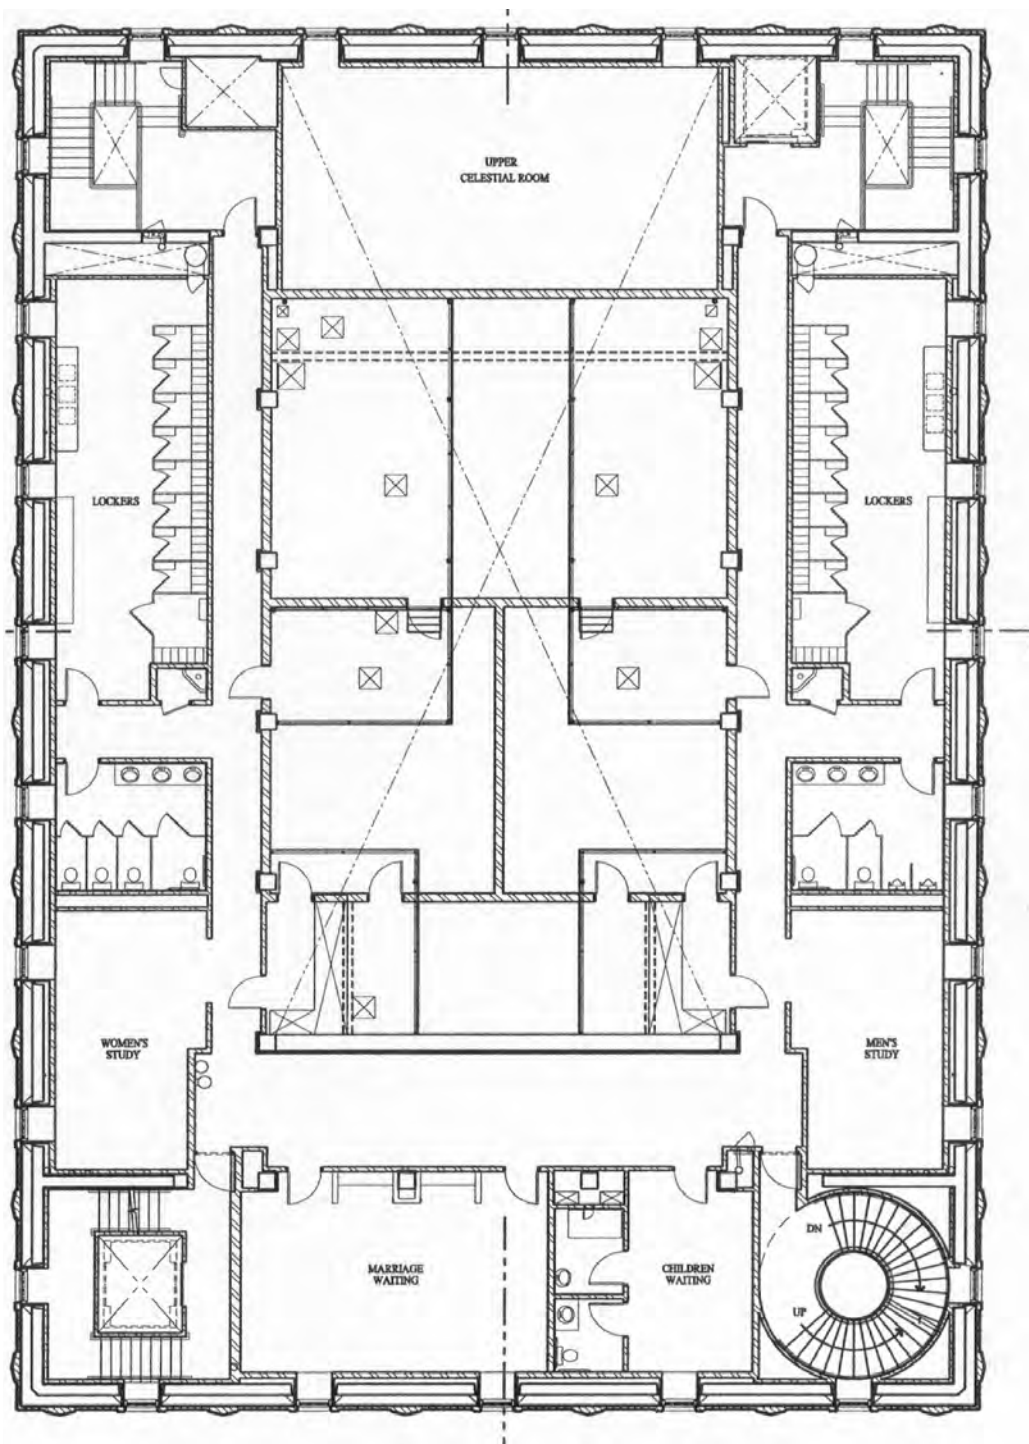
Second floor mezzanine plan of the new Nauvoo temple. Compare with original plans of the main floor on Figure 8. Courtesy FFKR Architects.
